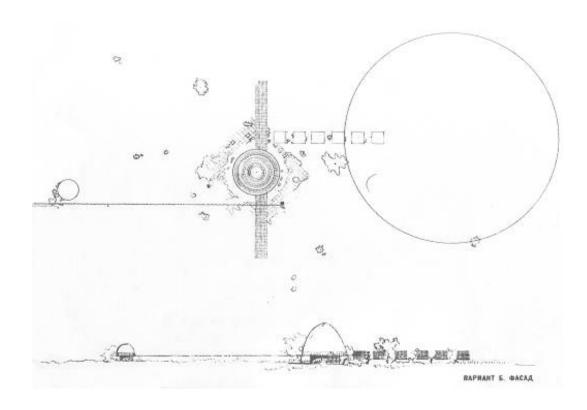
Club of New Social Type. VARIANT B. plan and elevation
